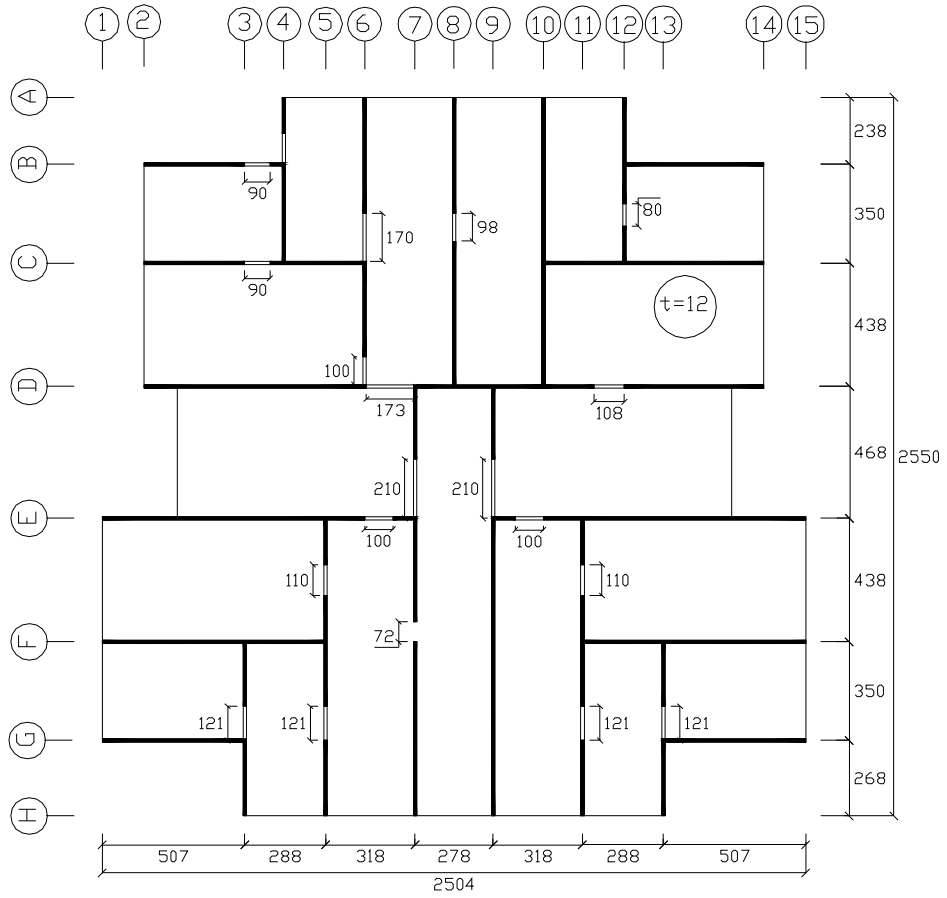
Typical plan view – Plan No. 13 (units in cm)
